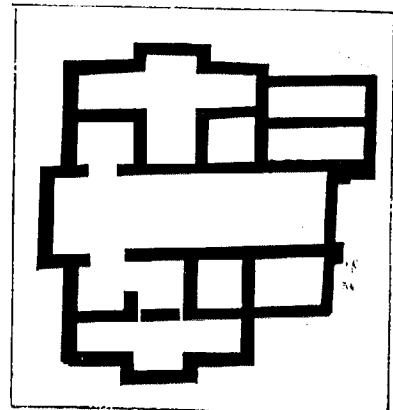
Plan of House in level II at Tell Abadeh (after Jasim 1979, Fig. 2).
